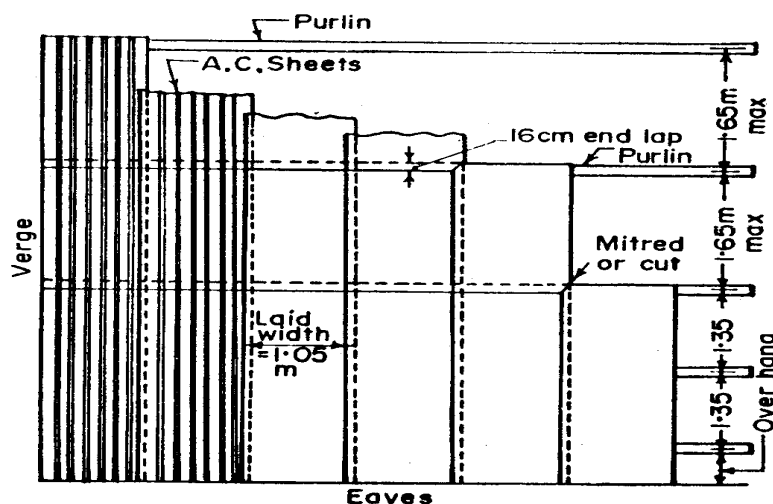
FIG LAYING OF AC. SHEETS (LEFT TO RIGHT)
